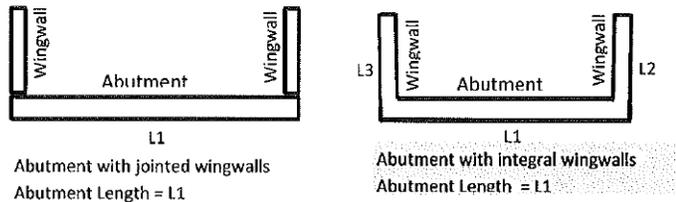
Reinforced Concrete Abutment Walls & Wingwalls
